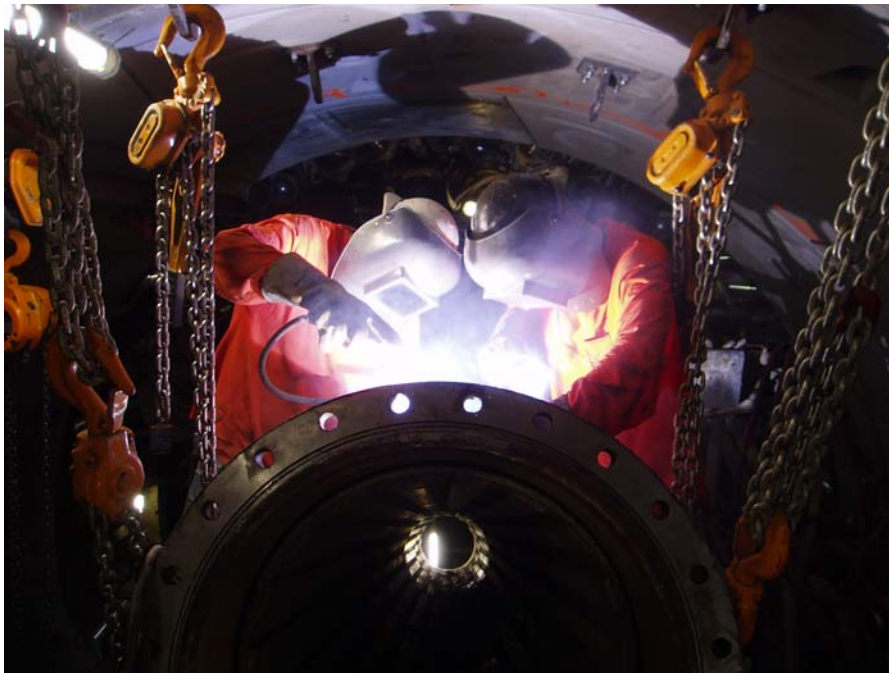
Arrowhead West Tunnel – Crew welding on auger tub
